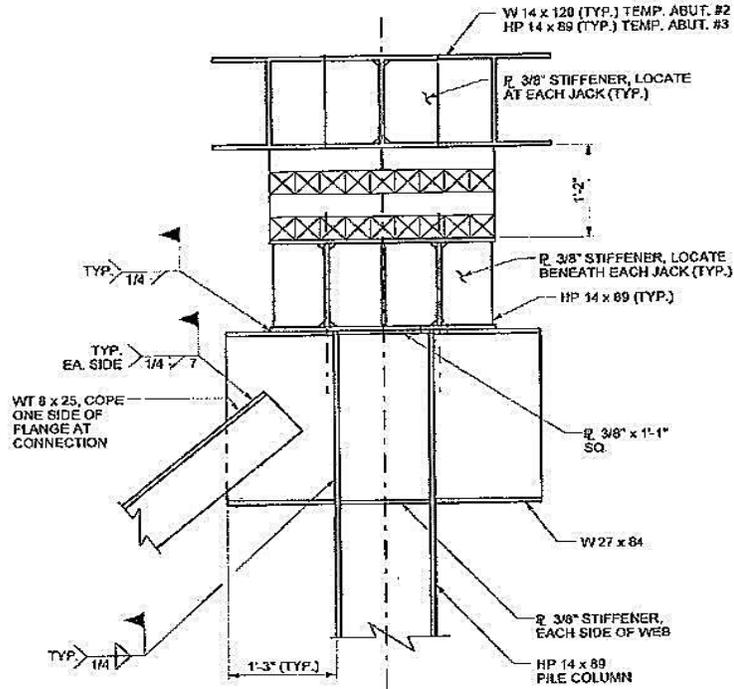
End view of the I-80 over 2300 East temporary substructure for the WB bridge
